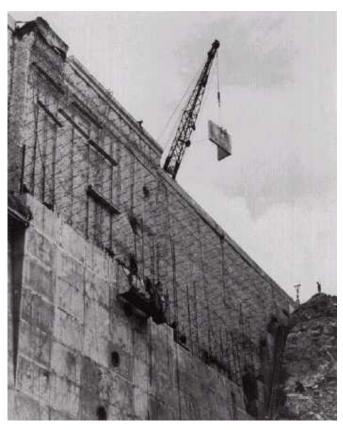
The use of precast concrete slabs as formwork during the refacing of Barker Dam (Nederland, Colorado) by PAC method in 1946
